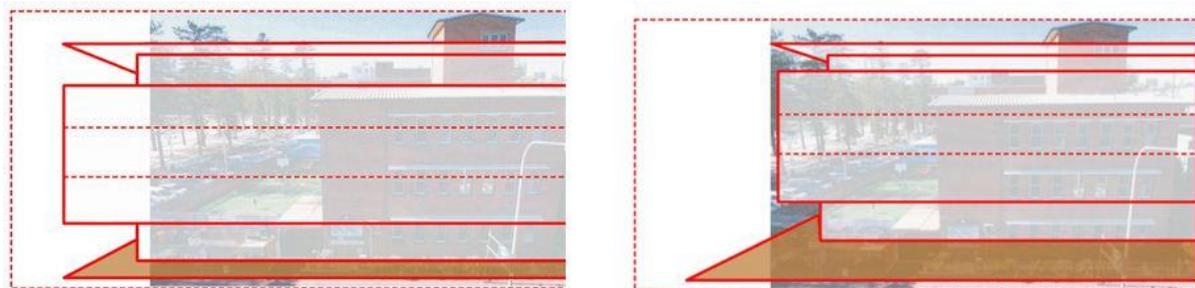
CONCEPT PLAN PHOTOMONTAGE LEFT AND PPR PHOTOMONTAGE RIGHT (SOURCE: ARCHITECTUS)
